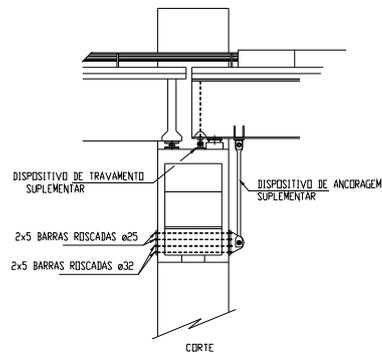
Replacing and strengthening the anchorage system of the deck to the transition piers
